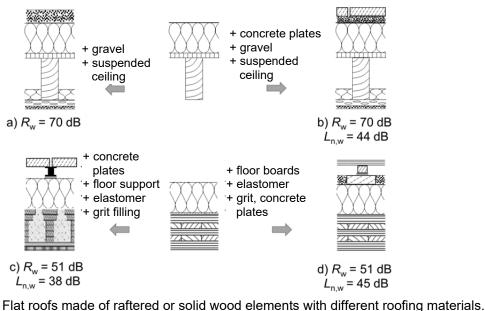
Flat roofs made of raftered or solid wood elements with different roofing materials.
